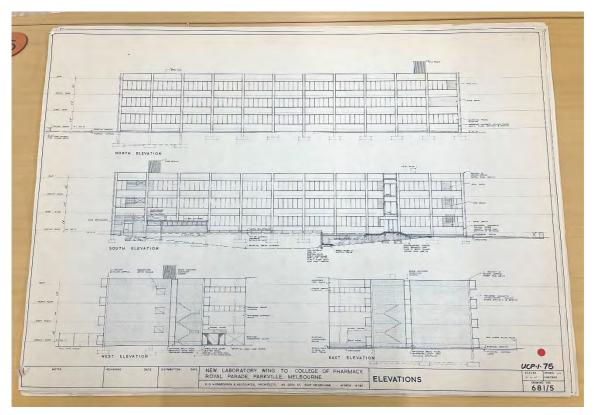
Drawing elevations of the proposed new building at 393 Royal Parade, Parkville (later named the Manning Building), by R G Monsbourgh & Associates, 1968. (Source: PROV 3686/P0014)
